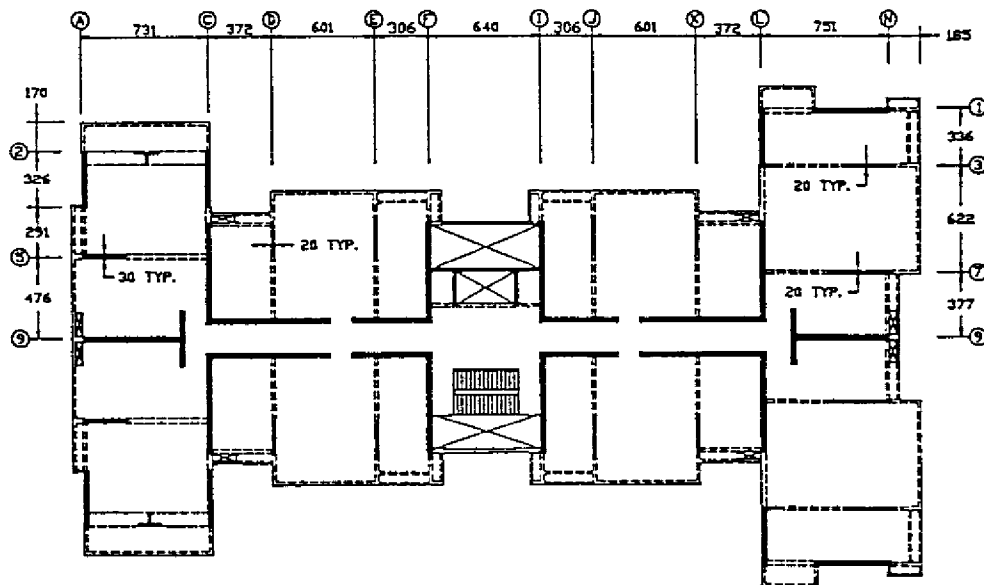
TYPICAL FLOOR PLAN OF A 14-STORY RC BUILDING IN VIÑA DEL MAR (UCB/EERC-89/05, Wallace and Moehle, 1989)
